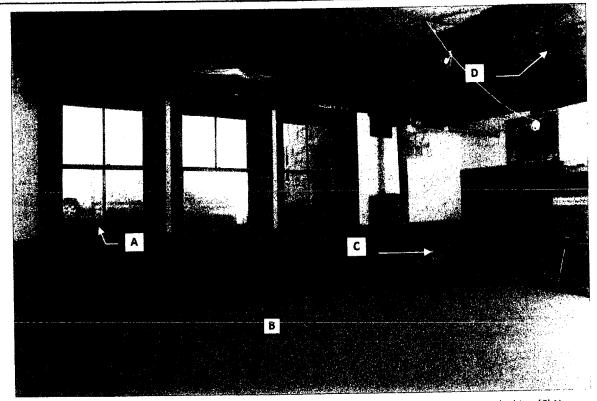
Room 2 view southeast. (A) Fenestration Type 1 – Basement Exterior, (B) Floor is painted white, (C) Nonhistoric wood burning stove, (D) Ceiling is covered with a tarp.
